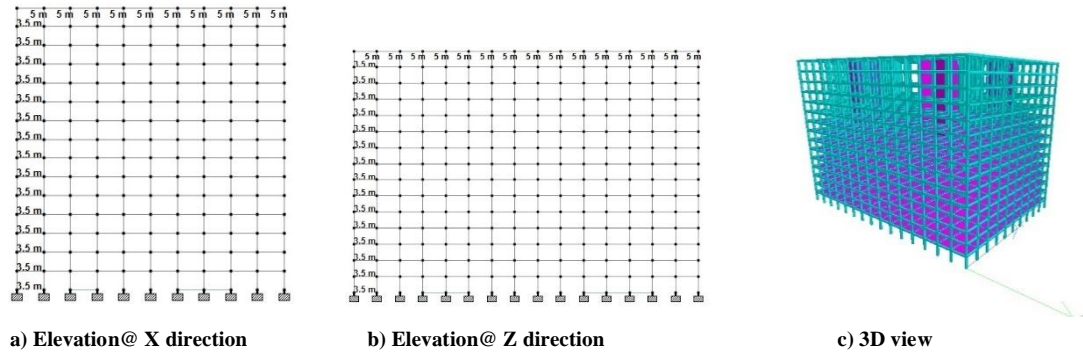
Model 3: G+14 Storey Building with L-shaped geometrical plan
